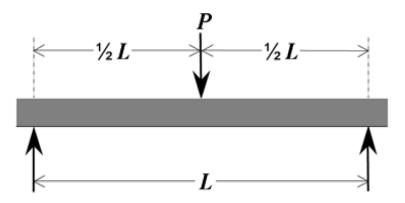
Test configuration used to determine the bending strength of the timber specimens (from ASTM 198 – 05A)
